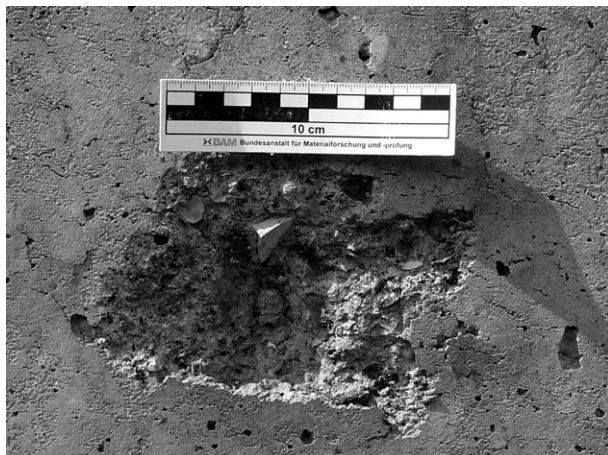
Spalling on a face of the outdoor exposure specimen.
